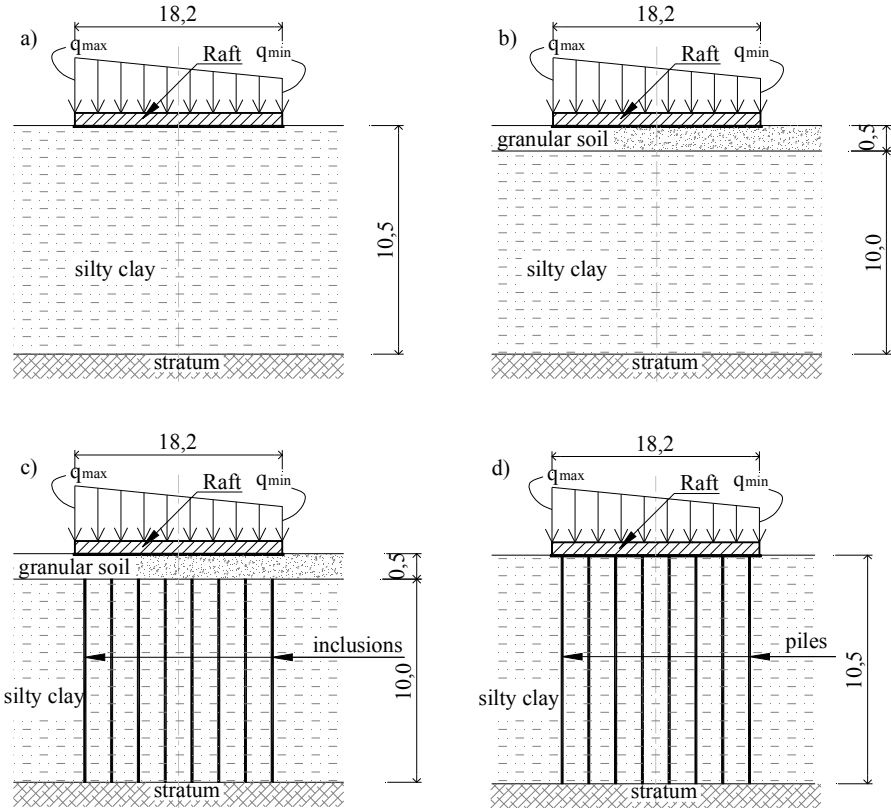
Case studies: a) only raft foundation - reference case; b) raft foundation with mattress; c) RI-raft foundation; d) piled raft foundation (no scale)
